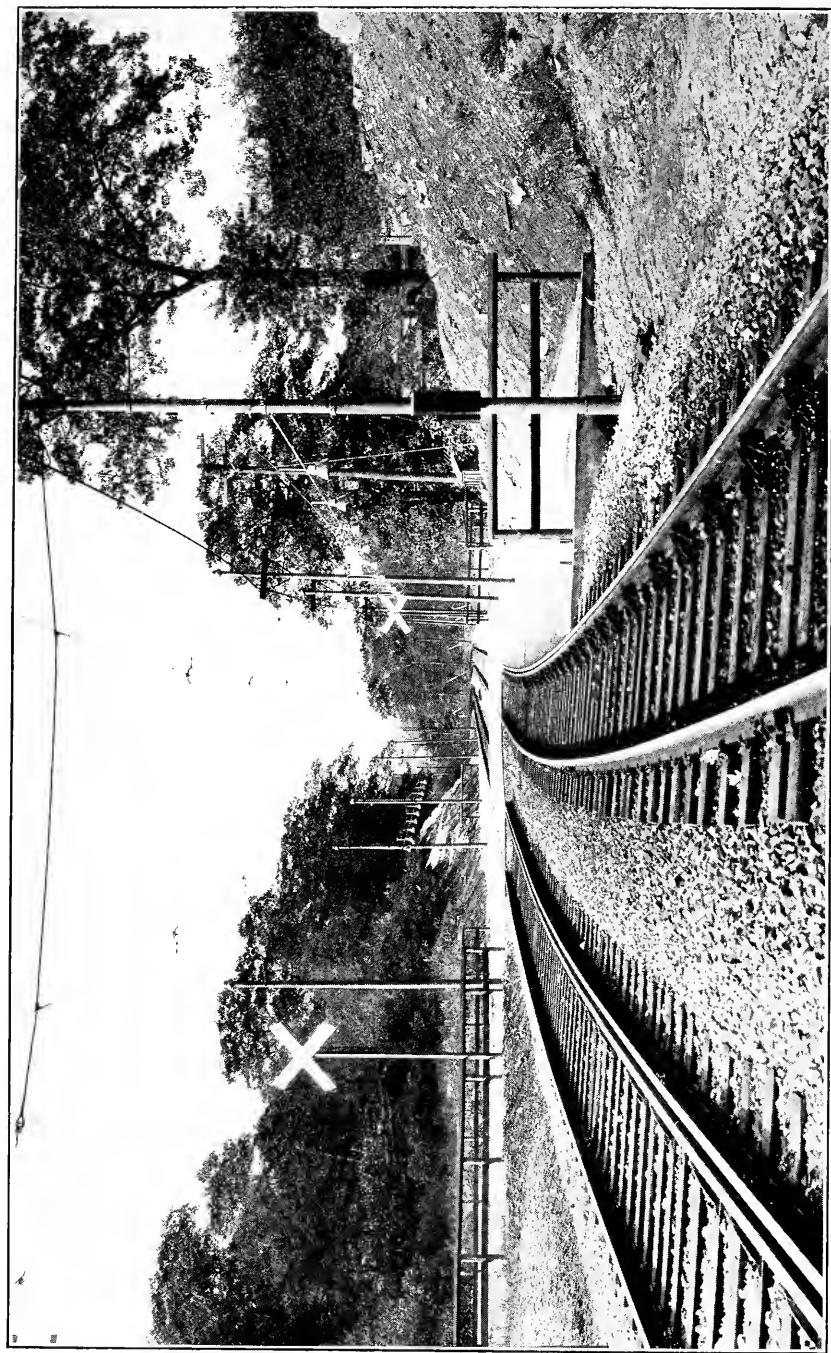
PLATE IX.—CAPEN STREET STOP-ON-SIGNAL STATION.
